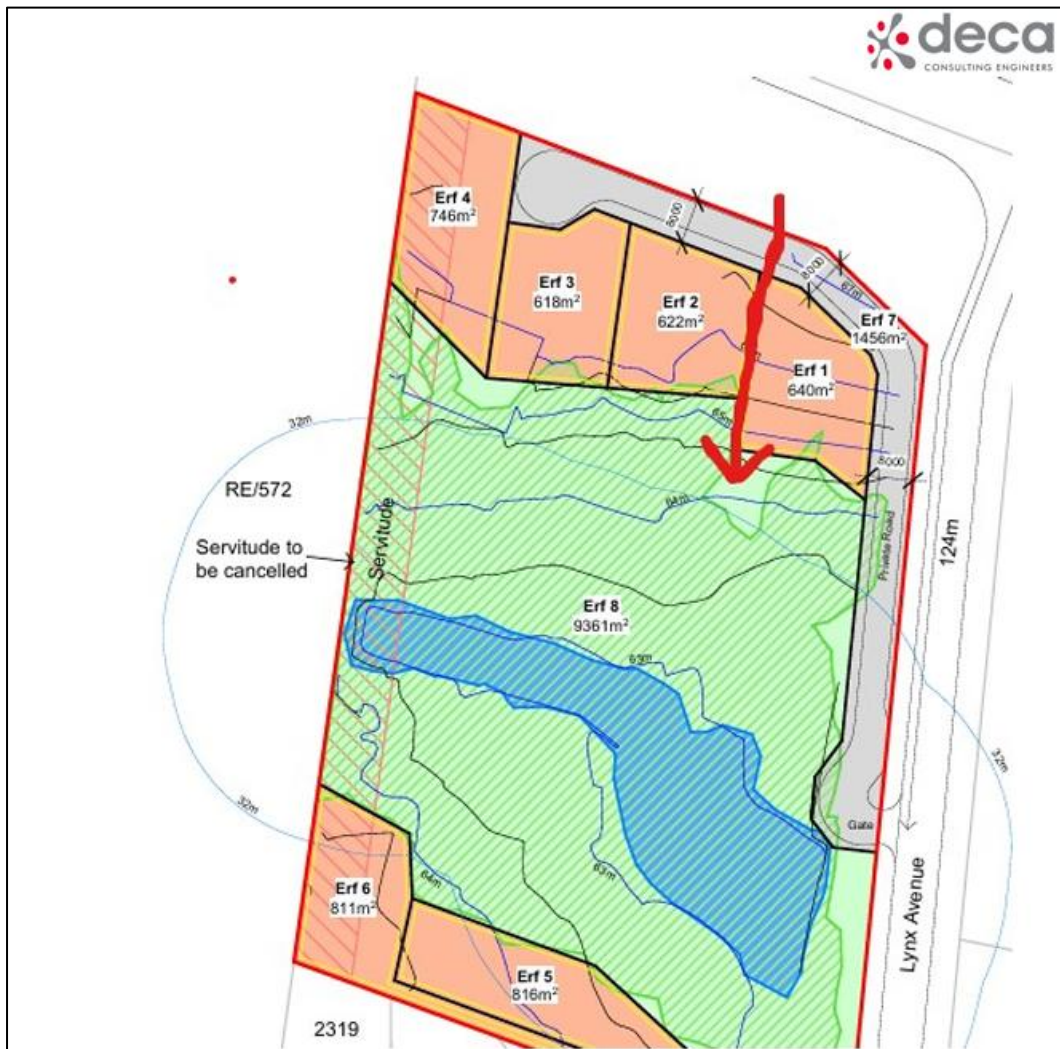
Proposed location of Permeable Paving and Enhanced Swale.
